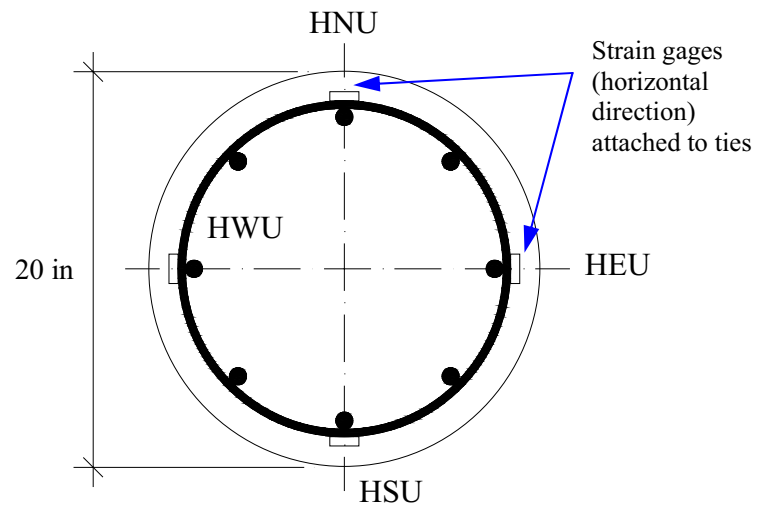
Section A-A and C-C; Strain Gages Location on Ties; Specimens A1, A2 & A3
